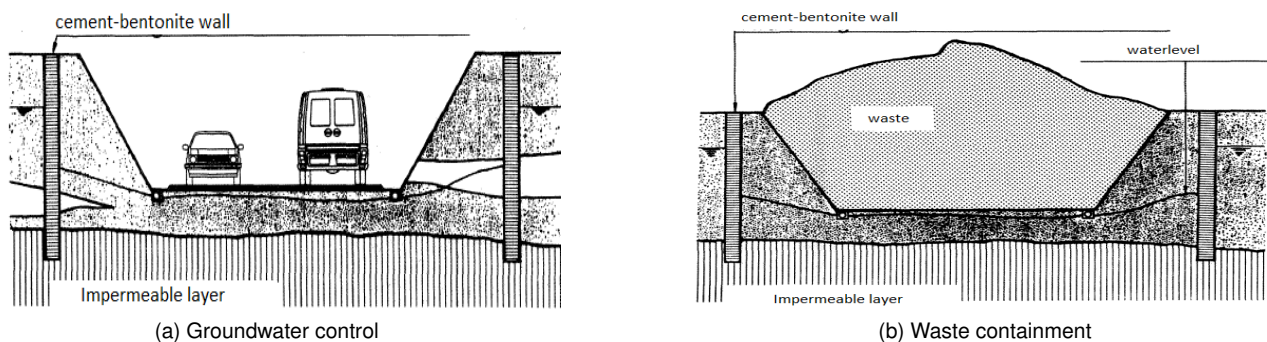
CB wall used to restrain groundwater (left) and isolate waste (right)
